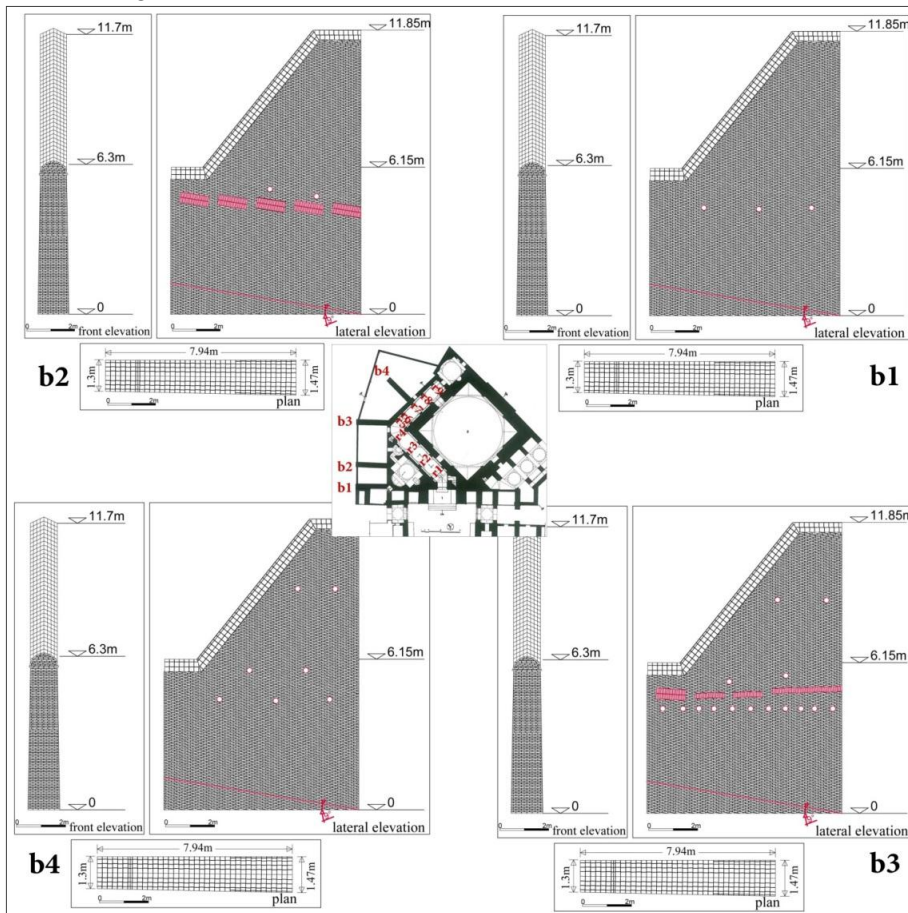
Plan, front elevation and side elevation of buttresses of Sheikh Lotfollah Mosque
